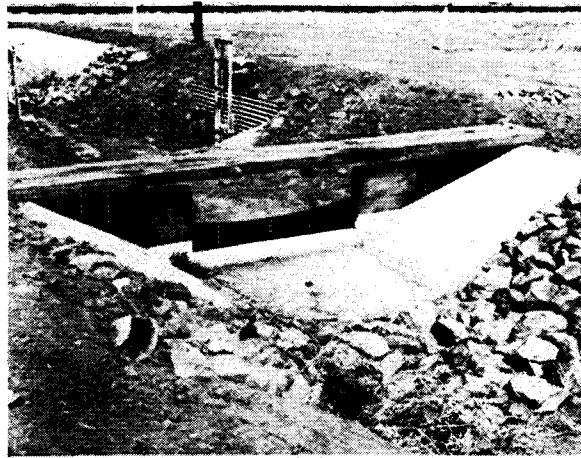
Concrete check structure. Metal turnout structures and outlet for railroad crossing in background. P 796-701-2630
